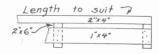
Crate rack for supporting sweet potato crates a few inches off the floor where bins are not used.
